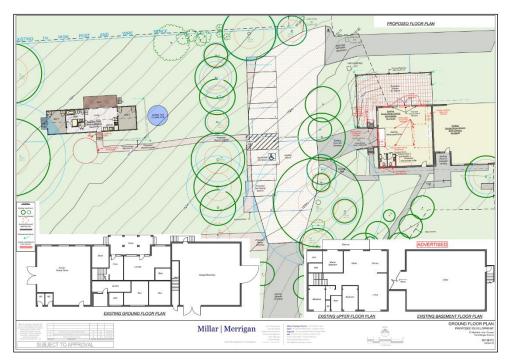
Floor Plan for Cellar door, car parking area and Small Second Dwelling
